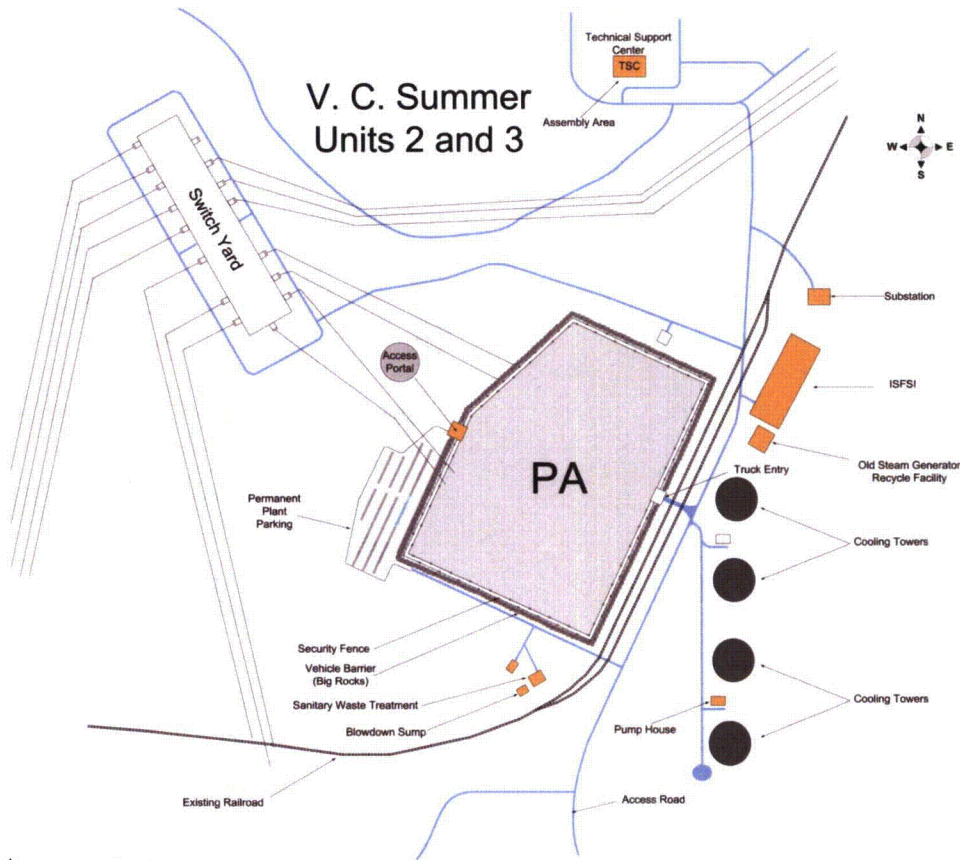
Units 2 and 3 Facility Layout (specimen)
